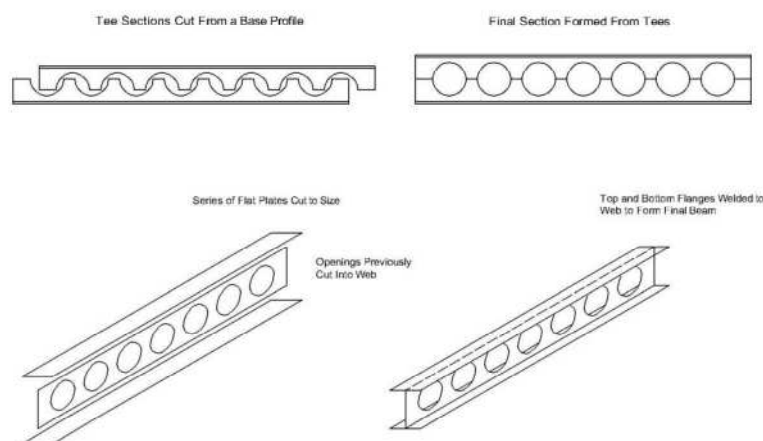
a) Castellated technique; b) Plate assembly technique for fabricating perforated beams
